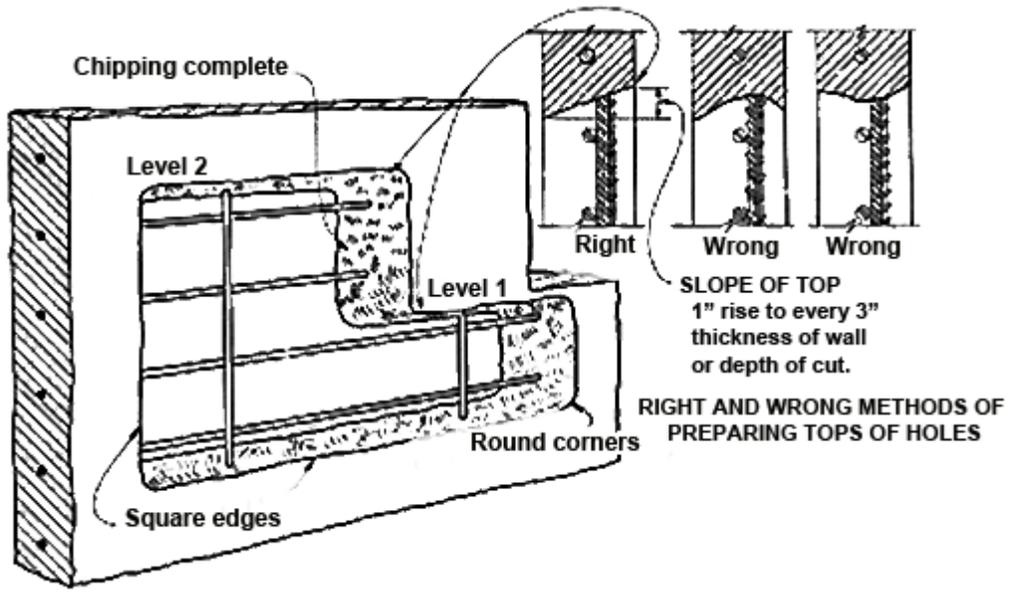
A schematic of the proper method for preparing a hole through a concrete wall.
